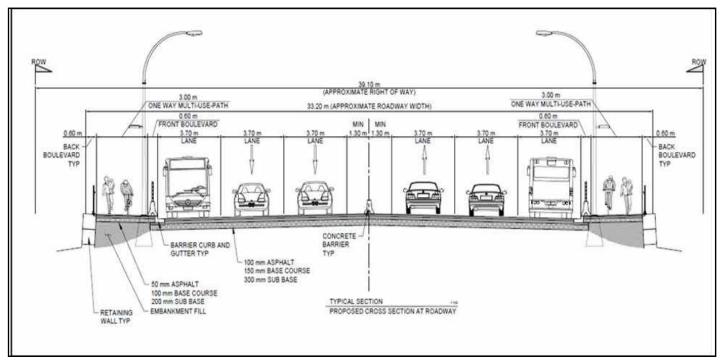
Lougheed Highway Typical Cross-Section - Westwood Street to Shaughnessy Street
